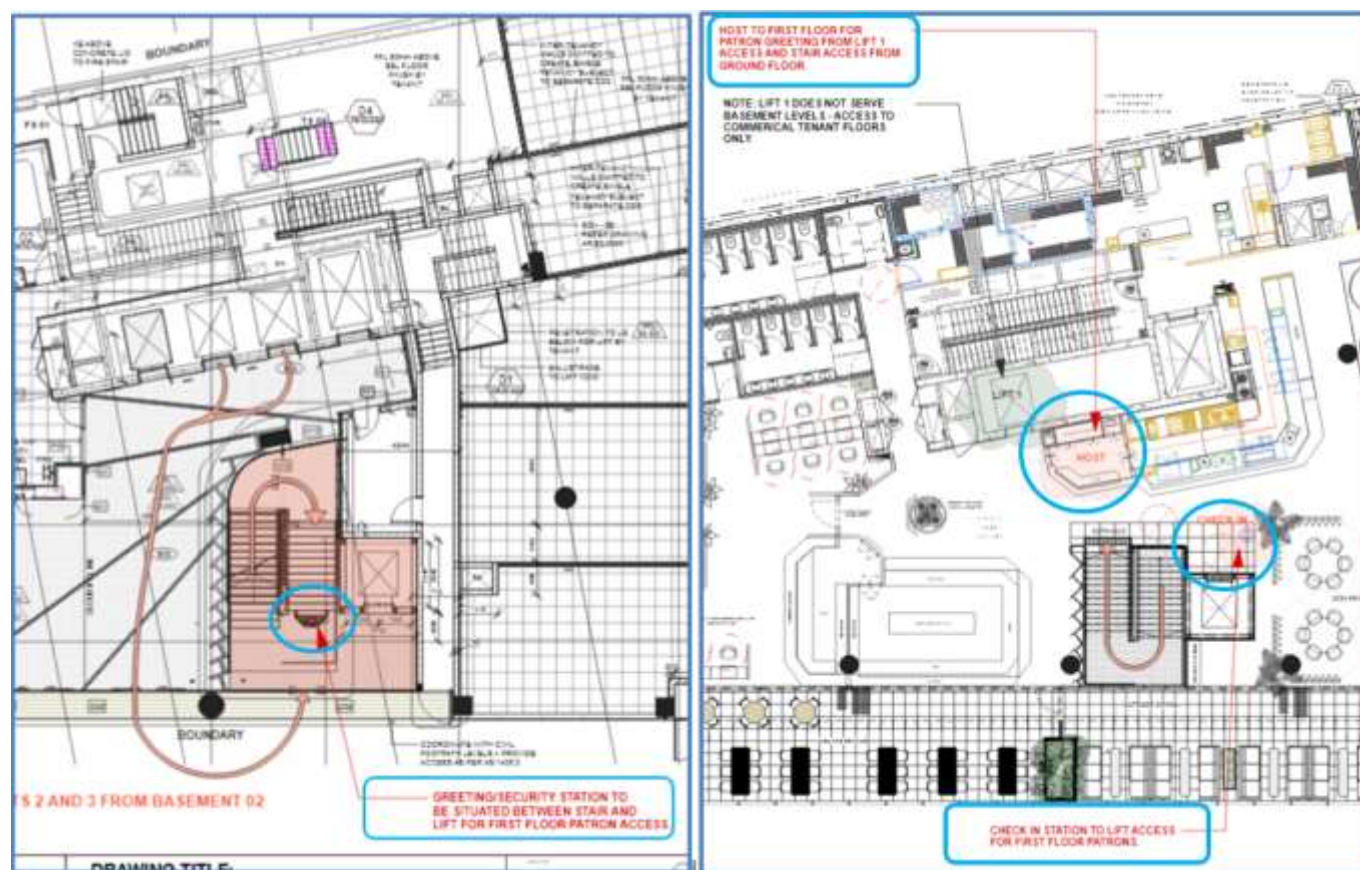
Ground floor entry and host desk to left, and First floor entry and host desk to the right
